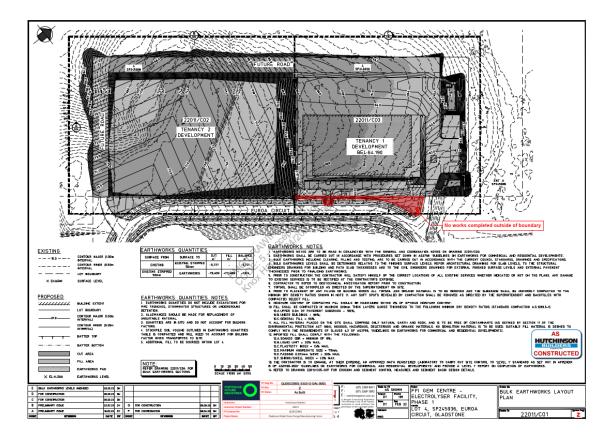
Bulk Earthworks Layout Plan as Constructed.
